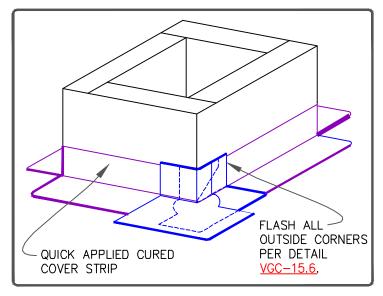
DETAIL NOT FOR USE ON 25 AND 30-YEAR WARRANTY PROJECTS. ACCEPTABLE FLASHING SHALL CONFORM TO DETAILS VGC-5.1 OR VGC-5.2.
